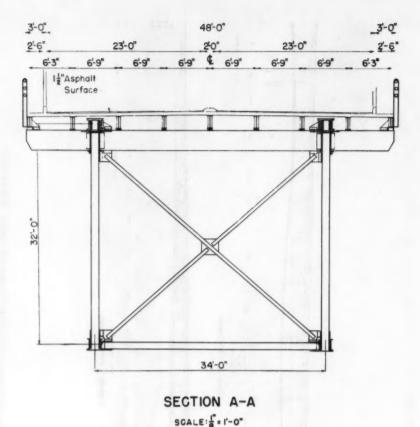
Cross-Section of Continuous-Truss Approach Spans.
